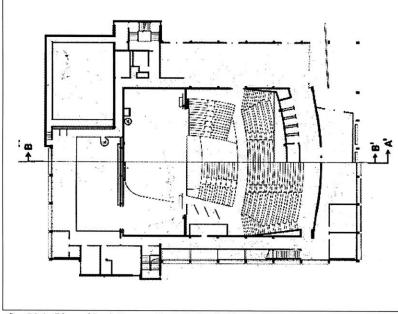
Plan of Loeb Drama Center, Cambridge, MA Izenour, Theatre Design
